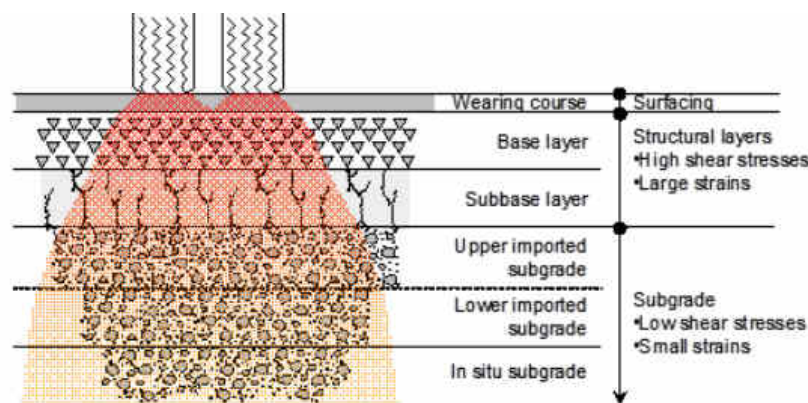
Typical layers of flexible pavements (SANRAL, 2014).
